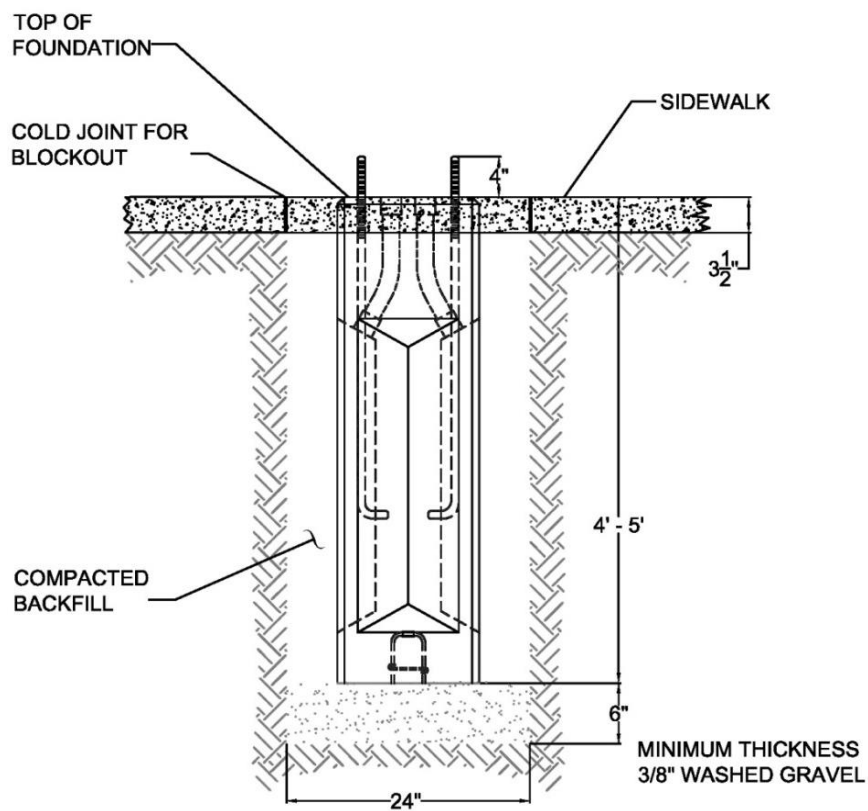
Requirements for In-Earth, With Incline, Installation, Elevation View
